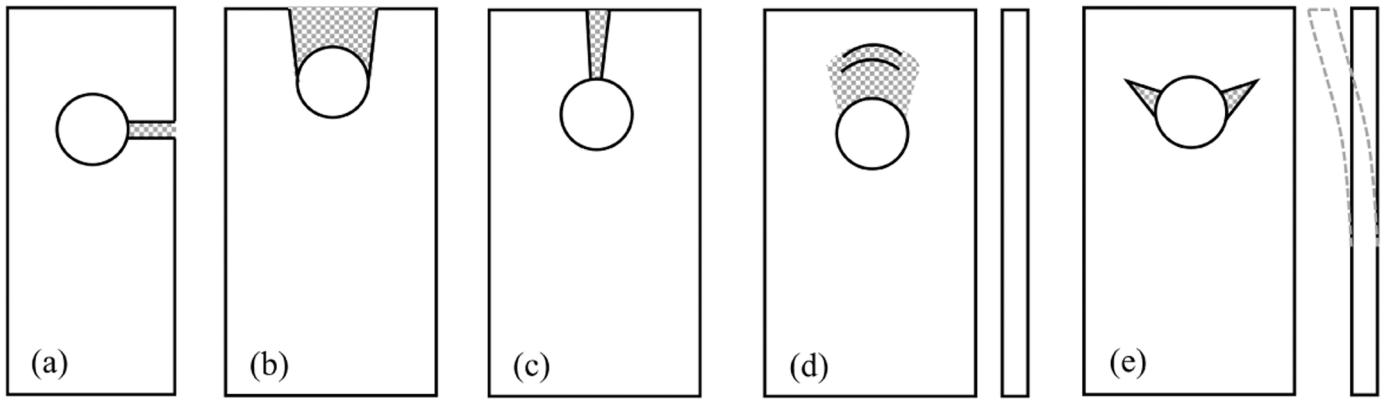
Schematic diagrams of various failure modes: (a) net section tension, (b) shear-out, (c) end-splitting, (d) bearing, and (e) tilt-bearing failure.
